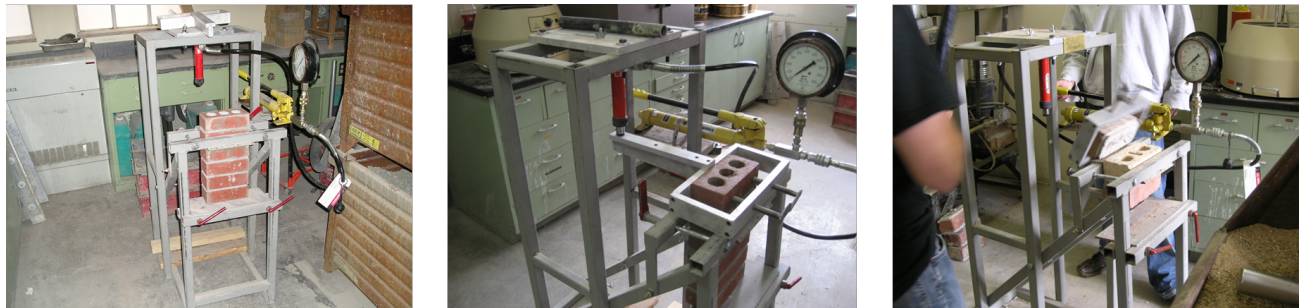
Bond wrench test procedure. Left: The prism is clamped to the retaining frame. Middle: The cantilever arm is clamped to the top brick and loaded. Right: Failure of the tested joint [3].
